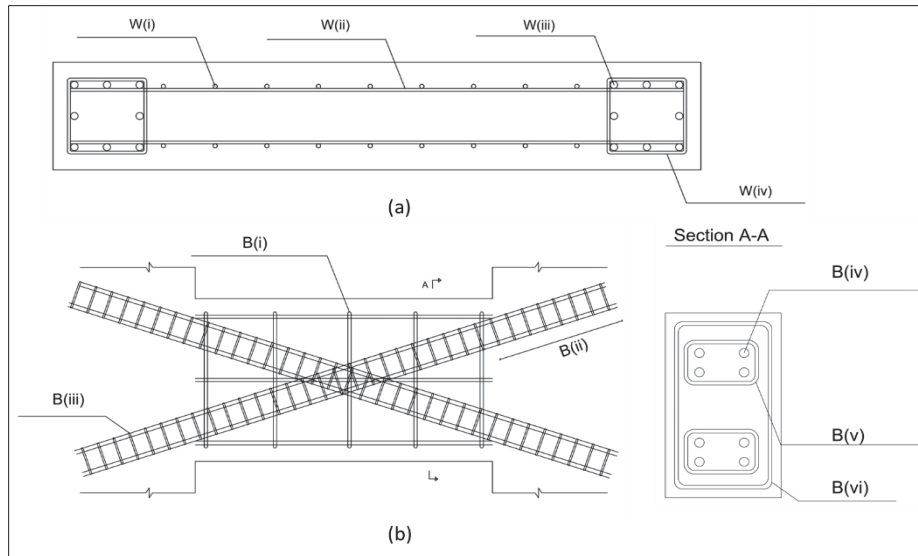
Reinforcement layout in (a) wall piers, and (b) CBs
